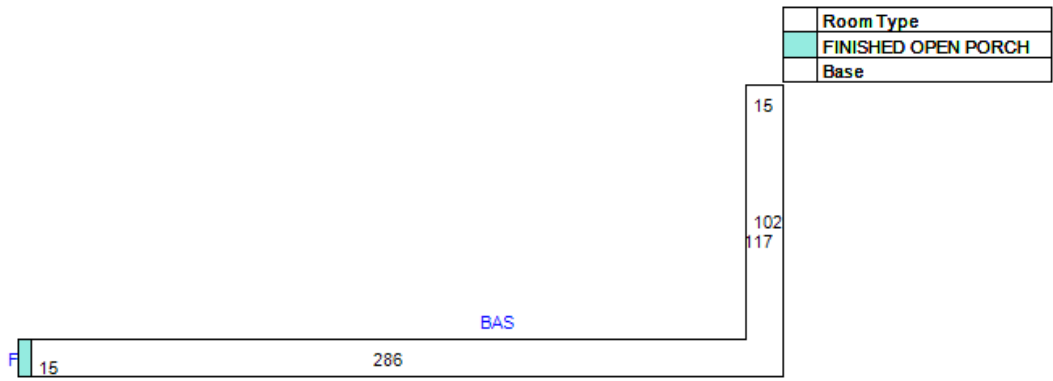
SJ03546 Building A Base Area plan (St. Johns County Property Appraiser)
